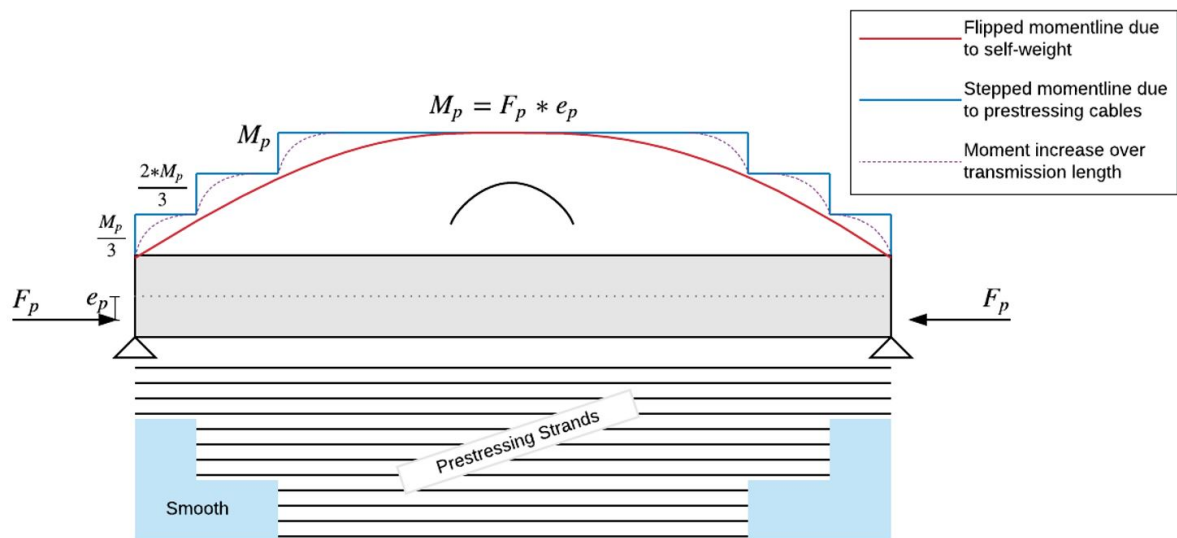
Principle of prestressing with straight bonded cables in prefabricated beams.
